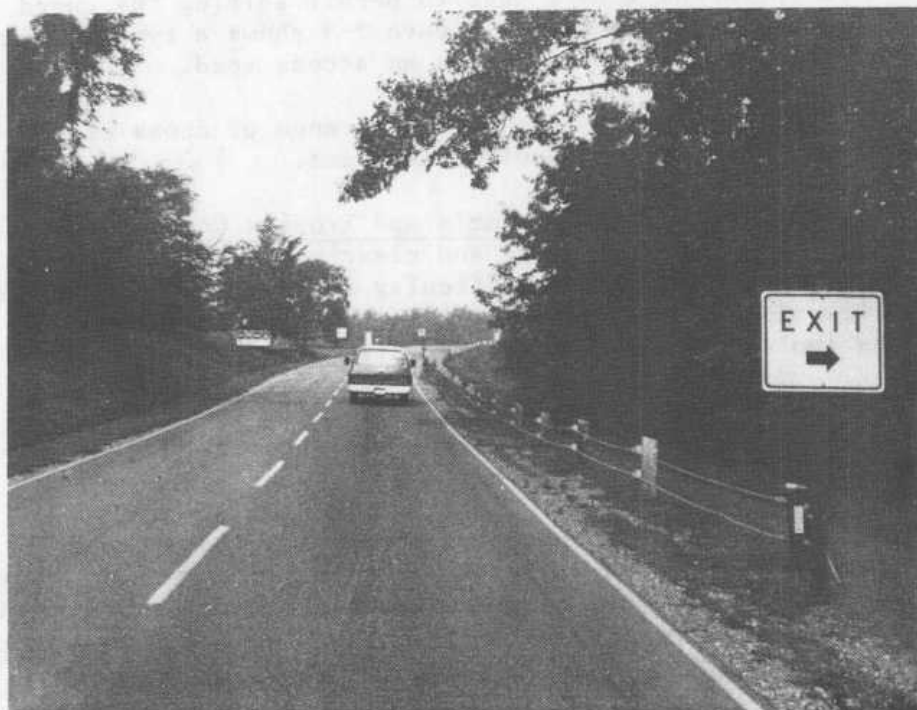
Cross Section Showing Pavement Striping, Shoulder and Guardrail
